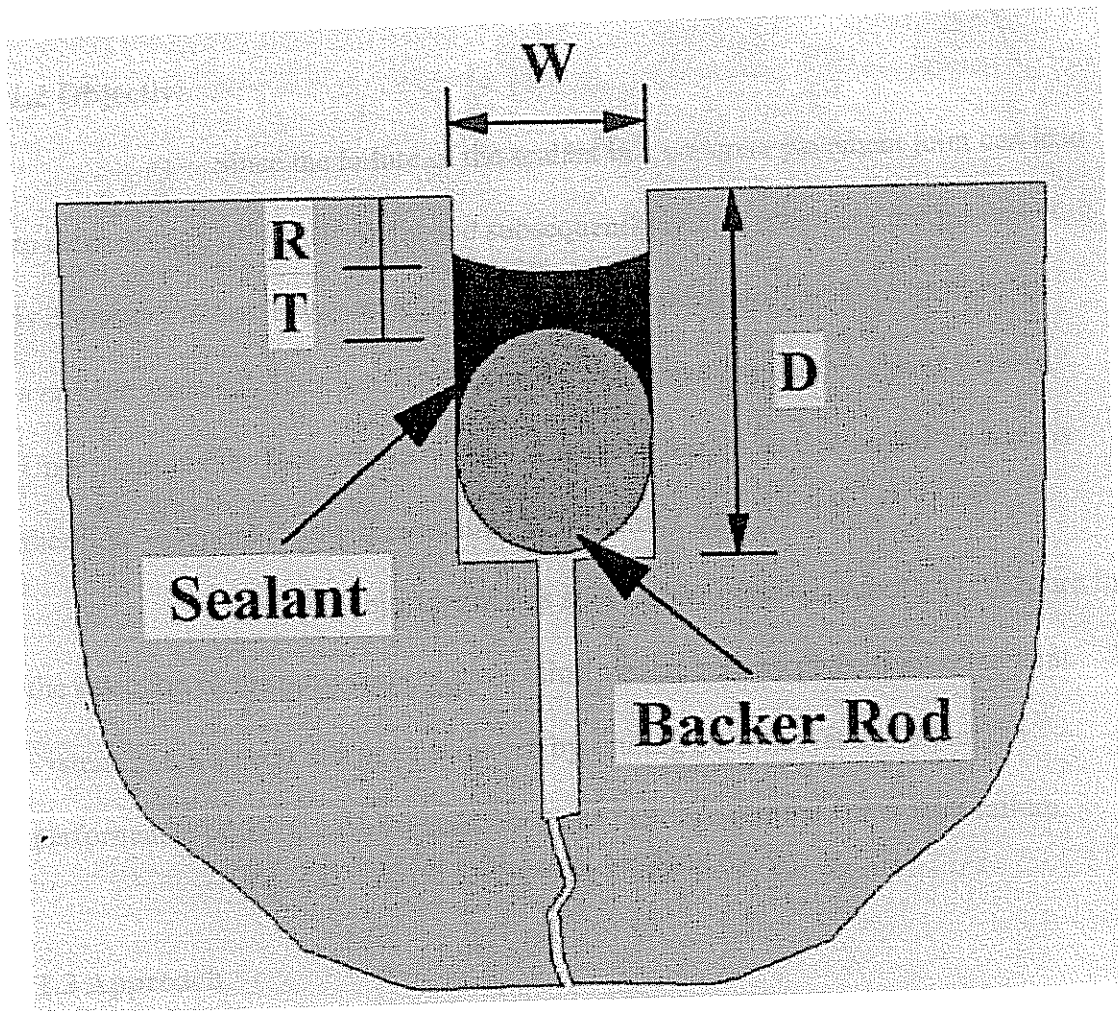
Typical Joint Cross Section [FHWA No. T5040.30 1990]
